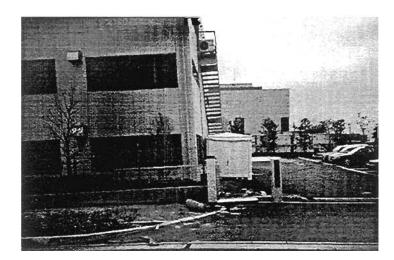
Tilting of a three story office building affected by lateral spreads
